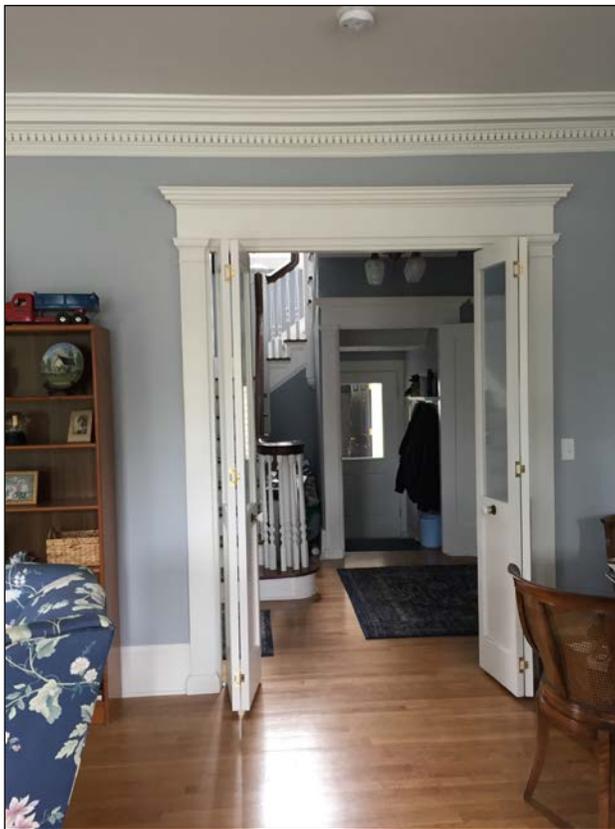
of 16. Bi-folding doors from living room to hallway and second floor stairs, camera facing west.
